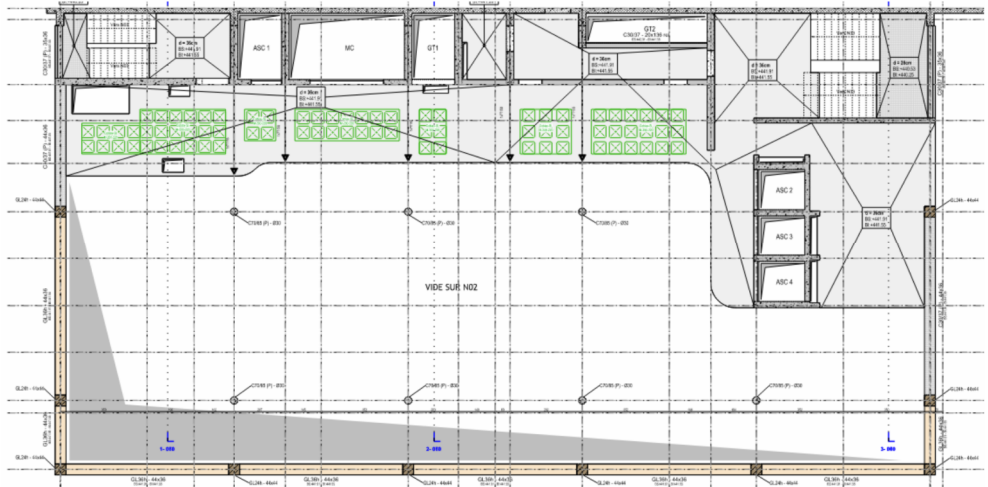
Load-bearing structure. Slab over N02 (similar to slab over N04)
